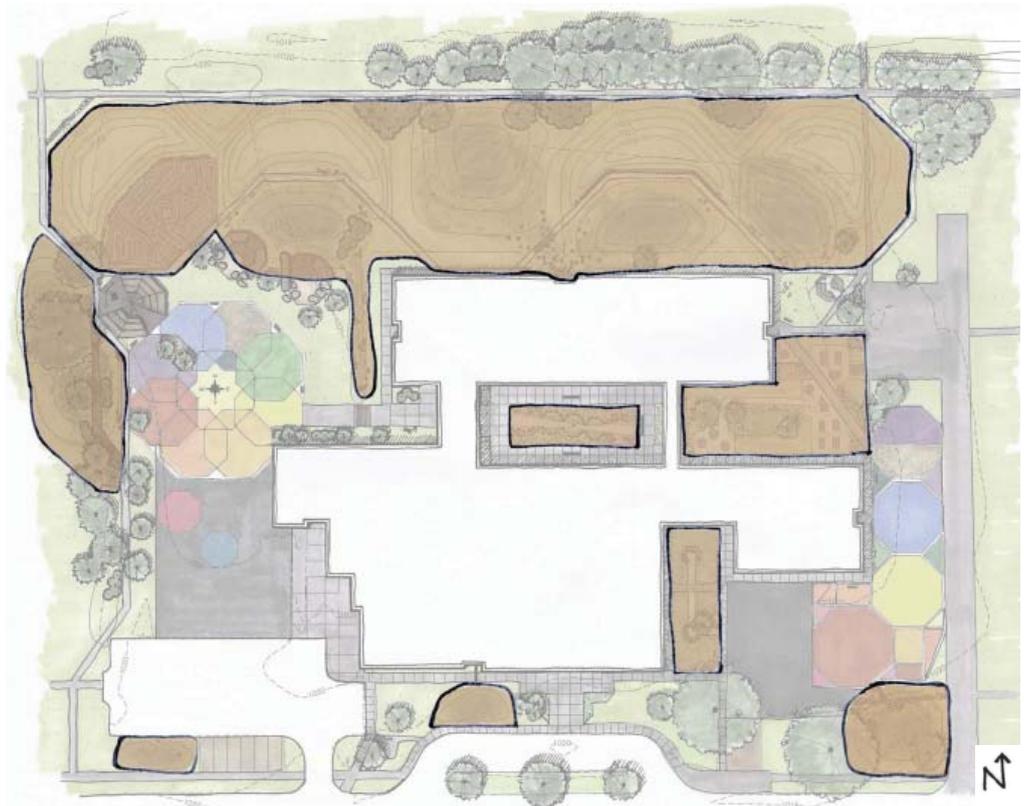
Proposed Maintenance Plan. Illustration by Author
